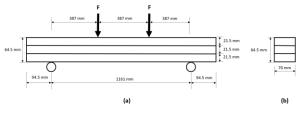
Sketches of the four-point bending test setup: (a) Side-view and (b) Cross-section view
